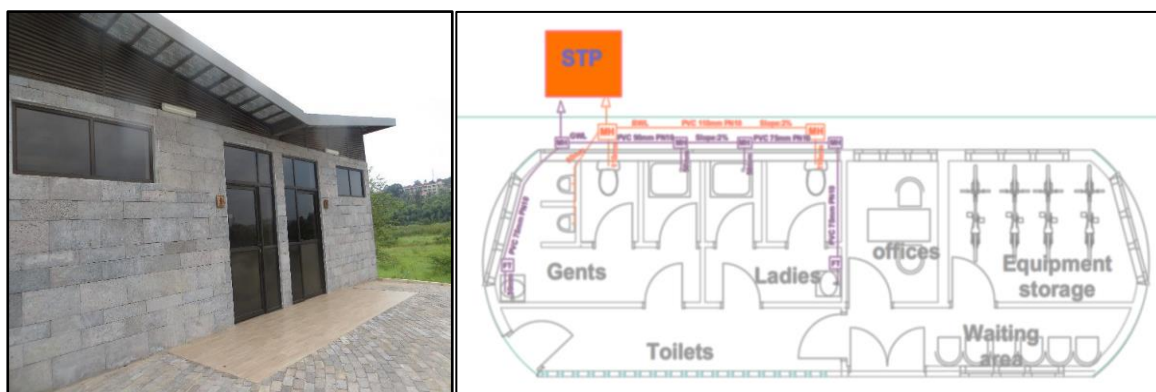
Restrooms located in the parking lot at the entrance located off the road to the Adventist University and the drainage water plumbing plan.
